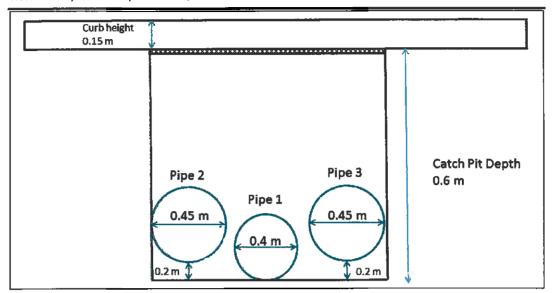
Conceptual Cross Section Schematic of the Catch Pit and the Stormwater diversion Pipes.
